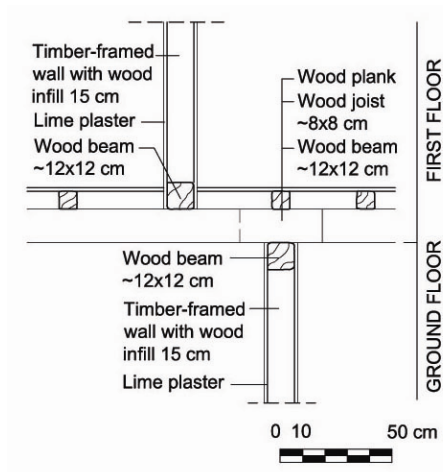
Connection detail of timber floor with timber-framed wall (Şeyh Cami St. No: 32)
